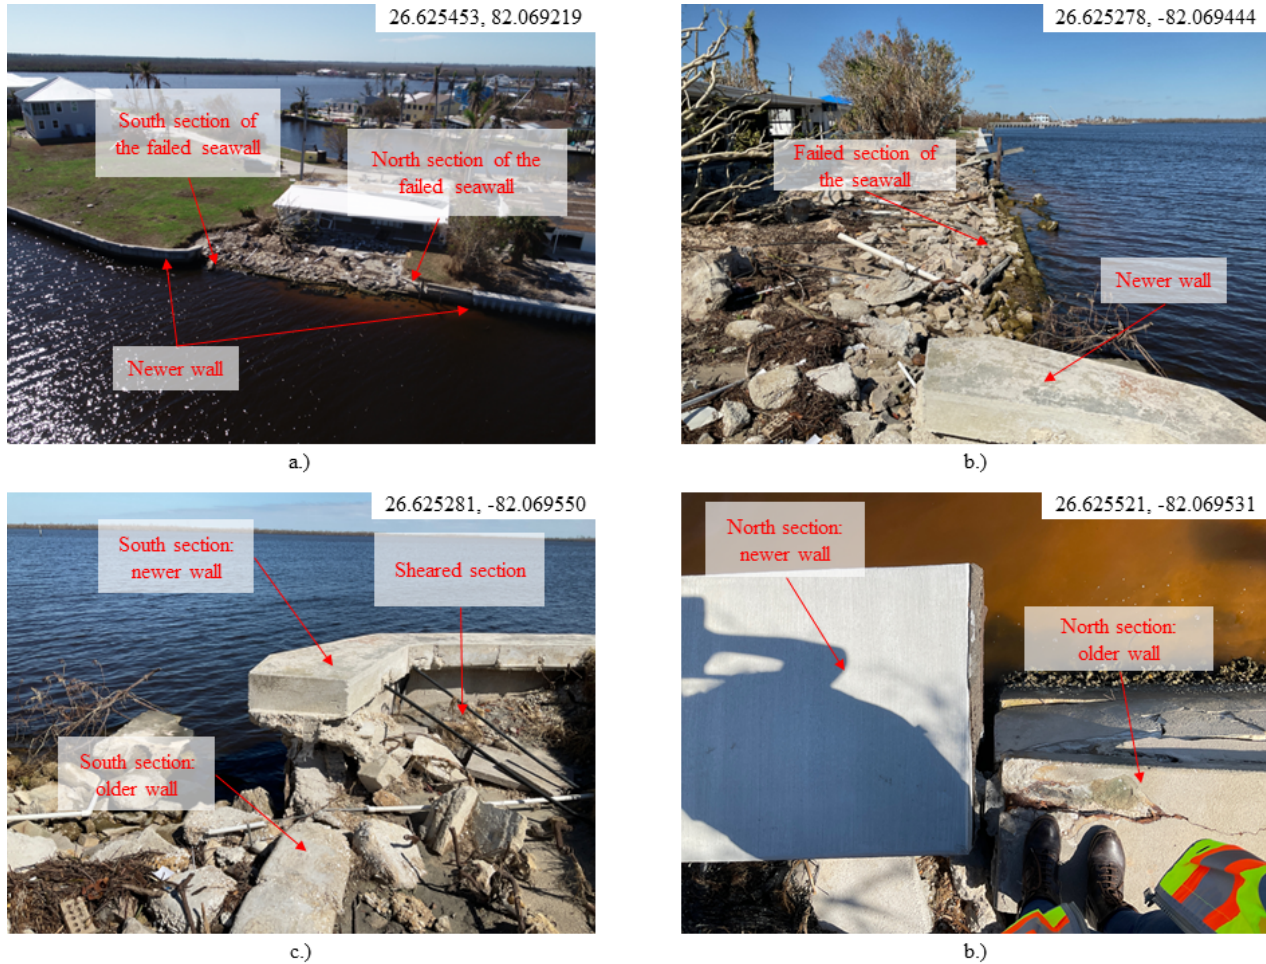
Damage to the seawall on the east of Matlacha Isles-Matlacha Avenue: a.) drone image depicting the newer installed seawall and the failed section of the old seawall believed to have failed at the intersection of the new and old one; b.) ground image showing the failed section of the seawall situated at the south of the river; c.) erosion behind the sheared section of the south seawall and breakage at the intersection of the old and new seawall; d.) plan view of the north section of the failed sea wall, depicting a stark contrast between the old failed seawall and the new one.
